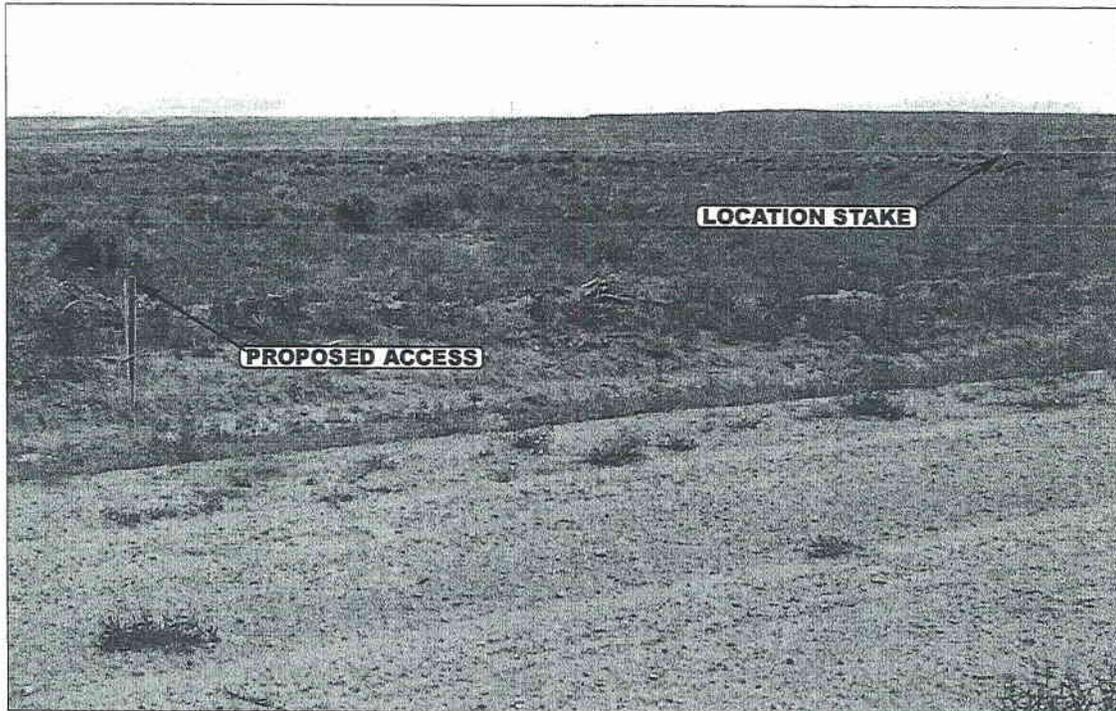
PHOTO: VIEW FROM BEGINNING OF PROPOSED ACCESS
